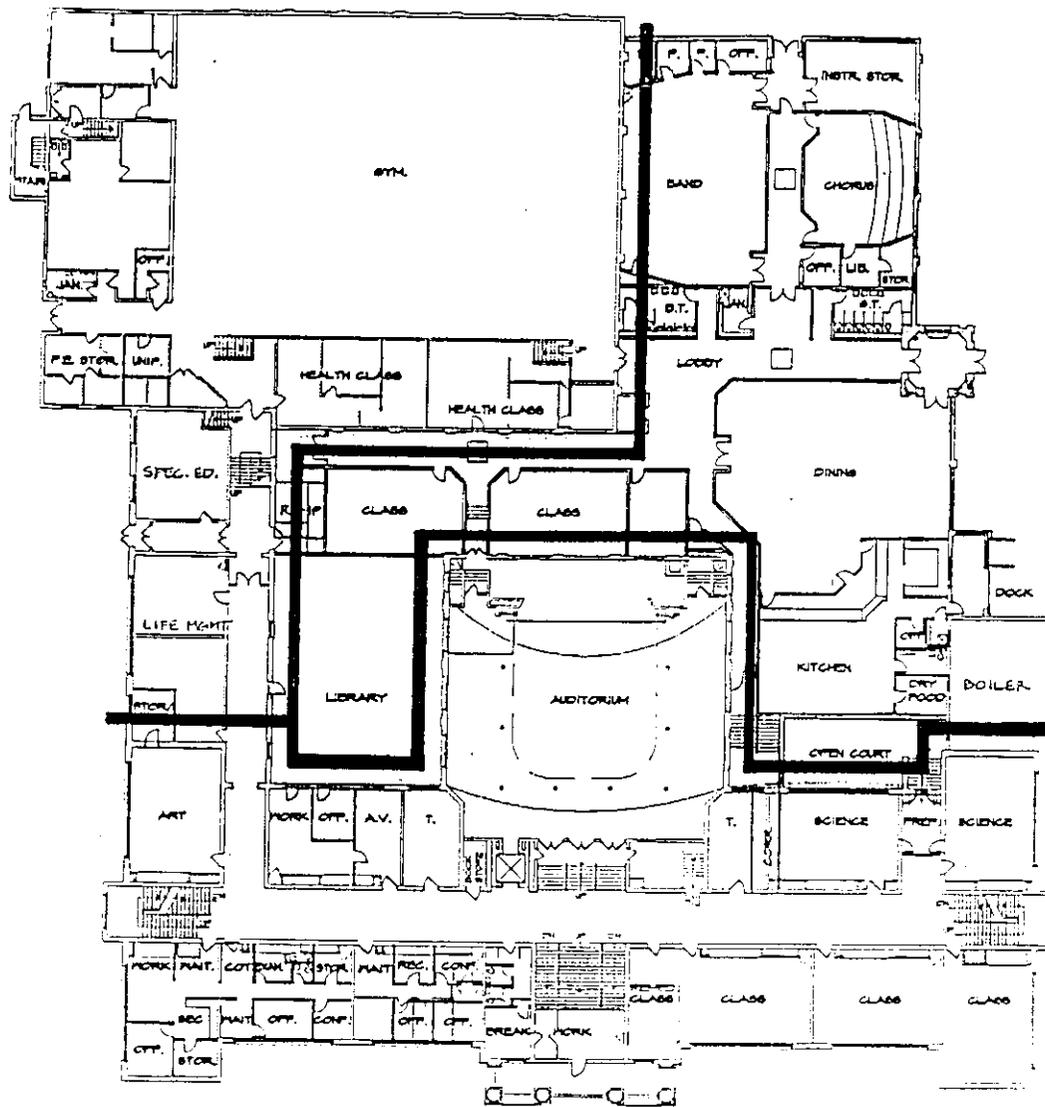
Exhibit C: First floor plan by Echols-Sparger & Associates, ca. 1996. Heavy lines indicate phases of construction: the original building, the 1940s gymnasium and connecting wing, and the 1990s cafeteria, library, chorus room, etc. addition. Plan not to scale.
